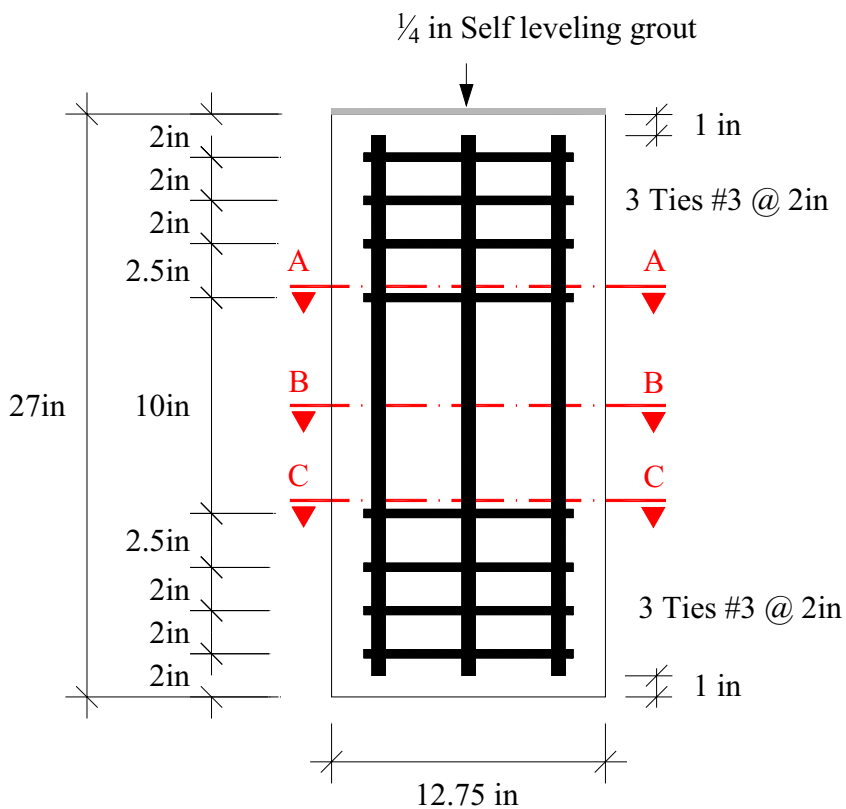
Longitudinal Cross Section; Specimens E1, E2 & E3
